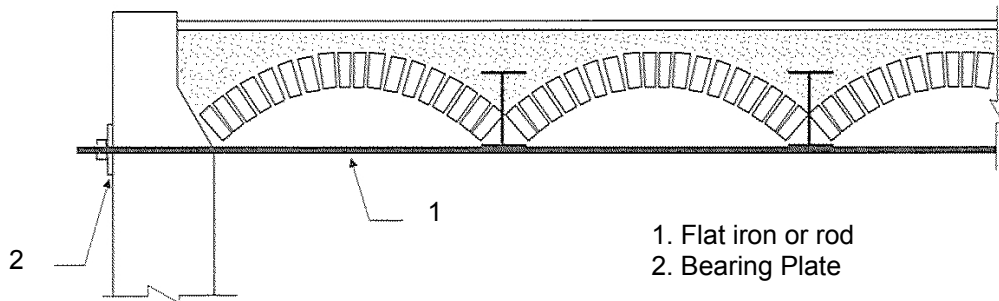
B Seismic Strengthening of Jack arch floor/roof
